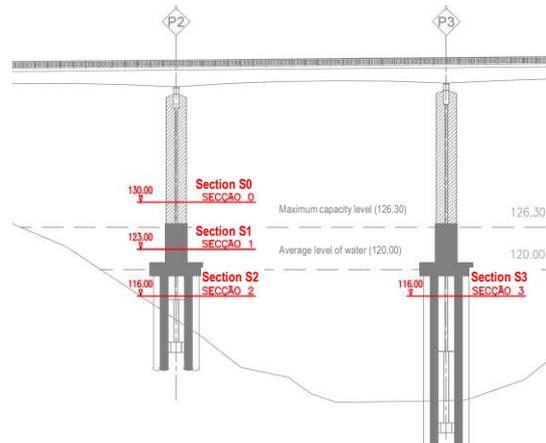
location of the instrumented sections at São João das Areias Bridge
